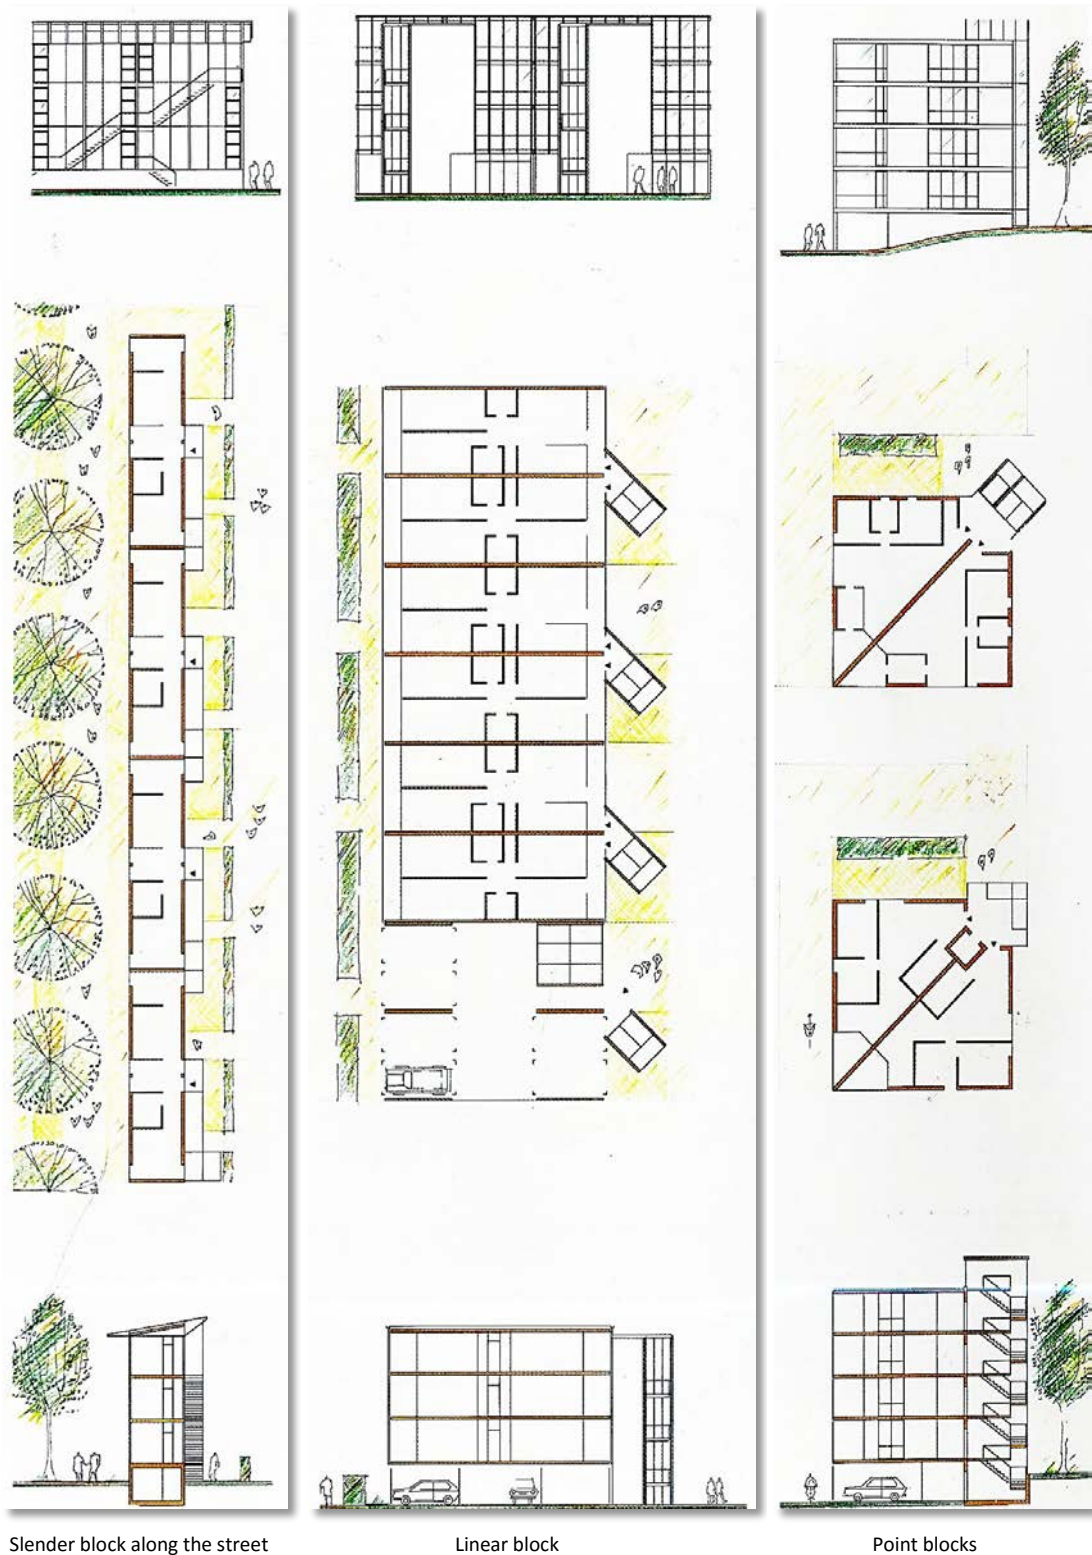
Solar city, Linz. Elevation, plan and section of the Slender & Linear block and Point blocks
